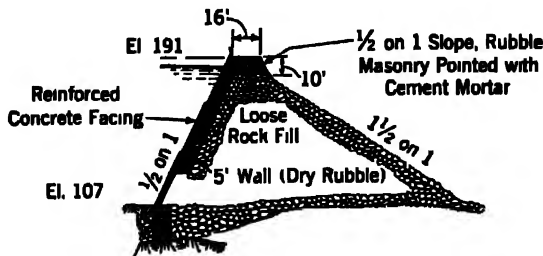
Section through Beaver Park Dam, Colorado (*Eng News*, Vol 73 p 660)
